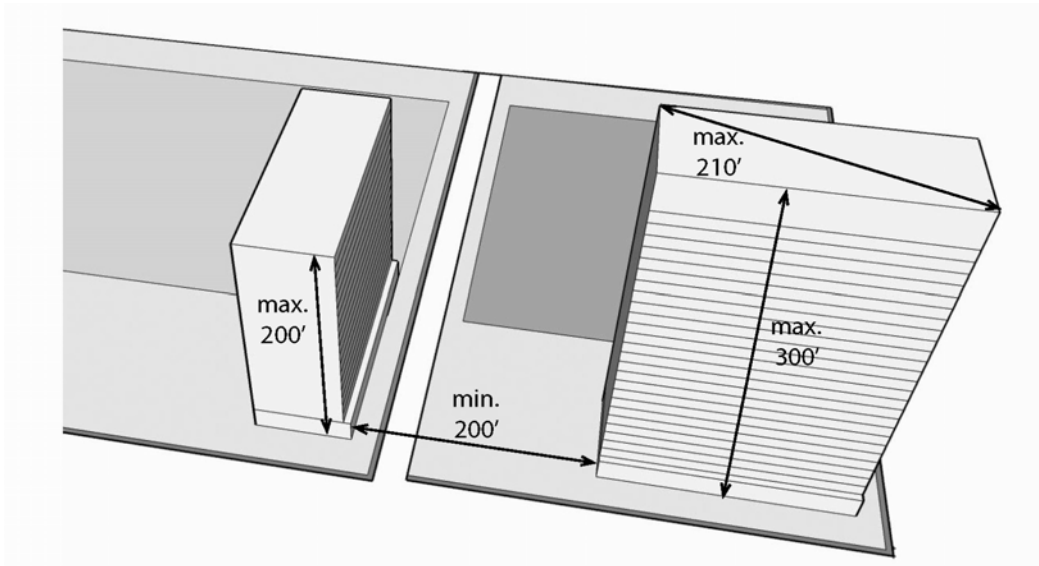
Height, Bulk and Spacing for Buildings 200' to 300' High near a Building 120' to 200' High
